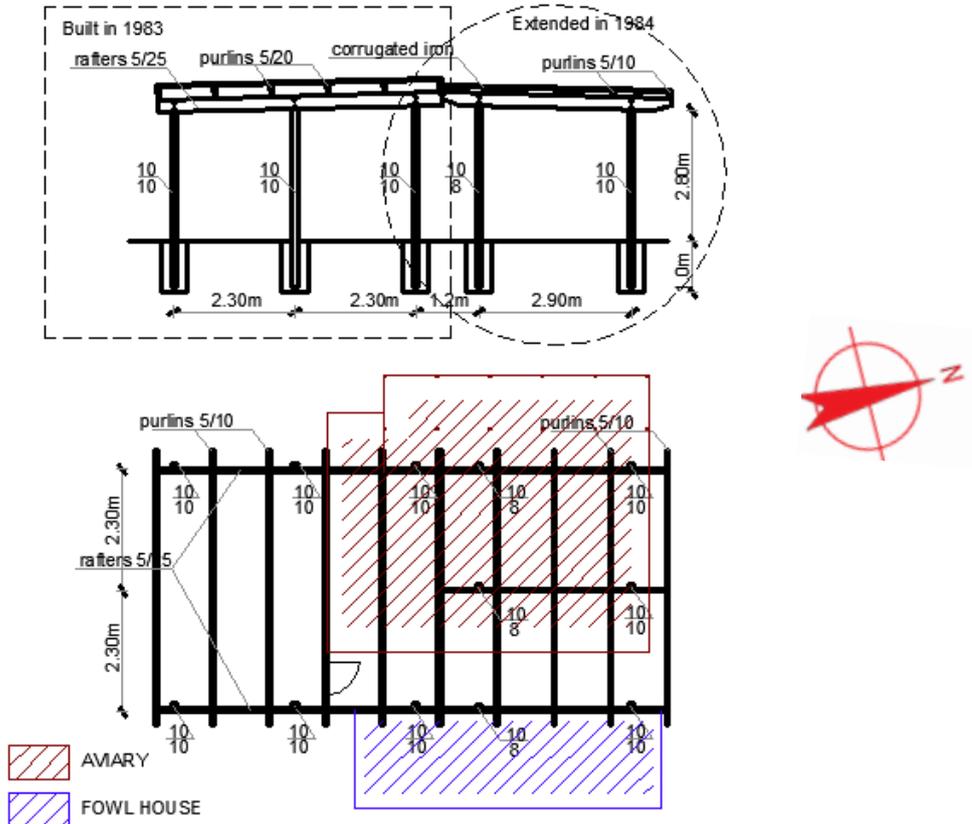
Plan Sketch of the PRIMARY Structure Showing Key Structural Elements
